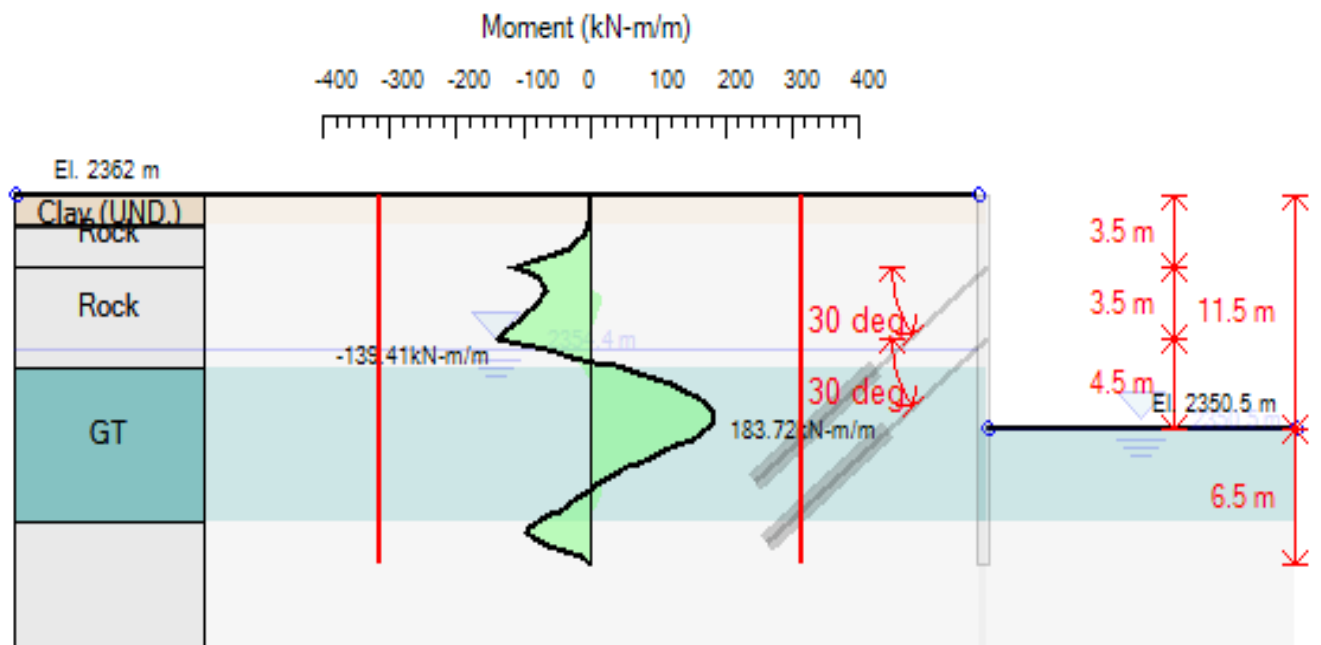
wall bending moment and moment capacity for 0.9 m and 3.5m first anchor level
